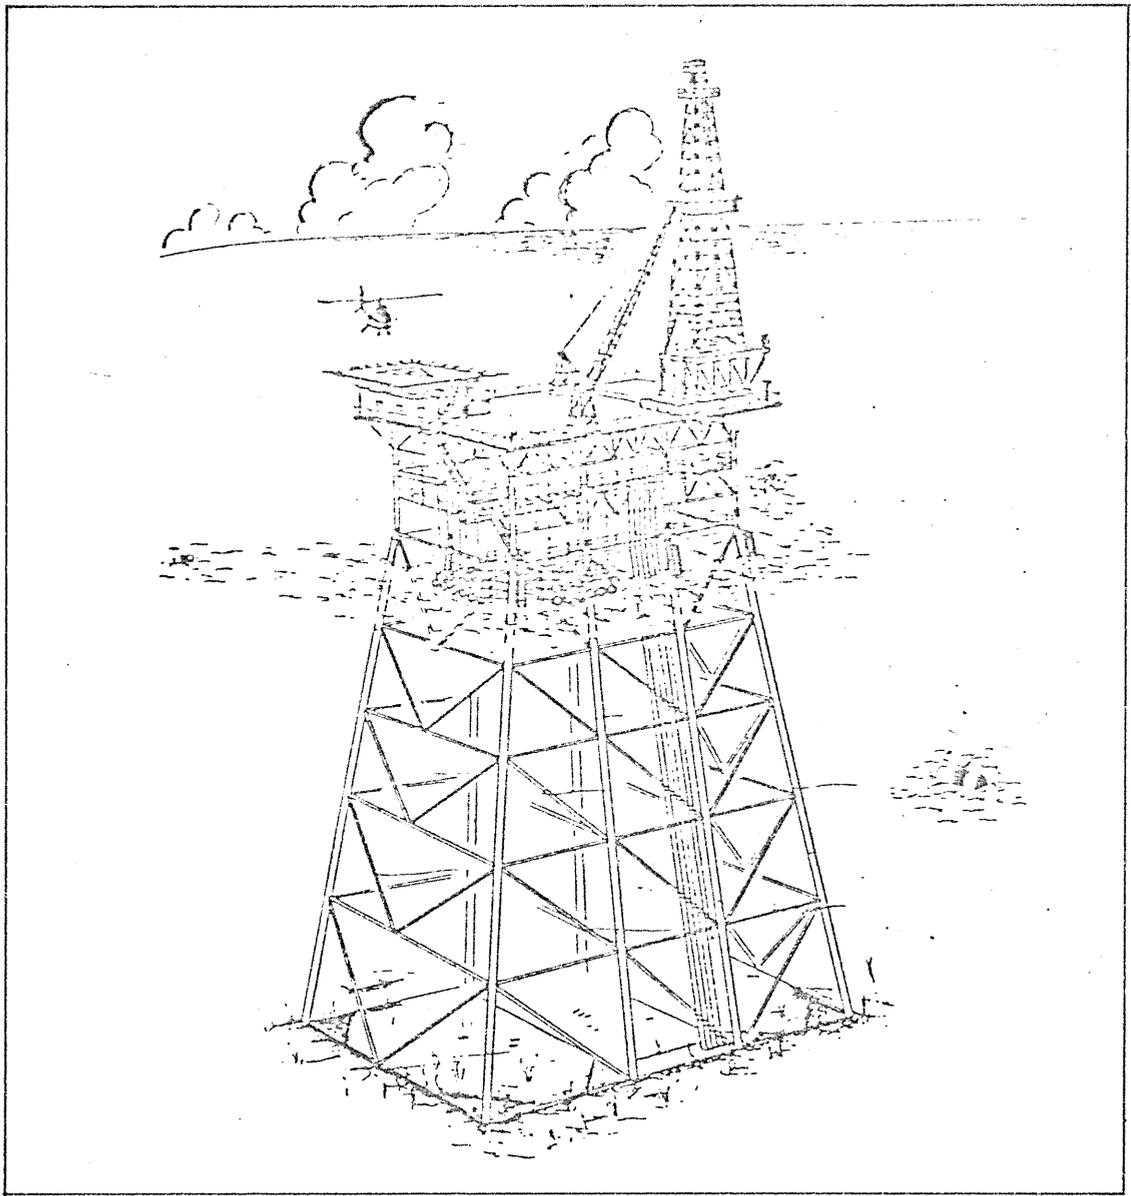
Typical Template-type Structure used for Oil Drilling (after Civil Engineering in the Oceans, Ref. 7).
